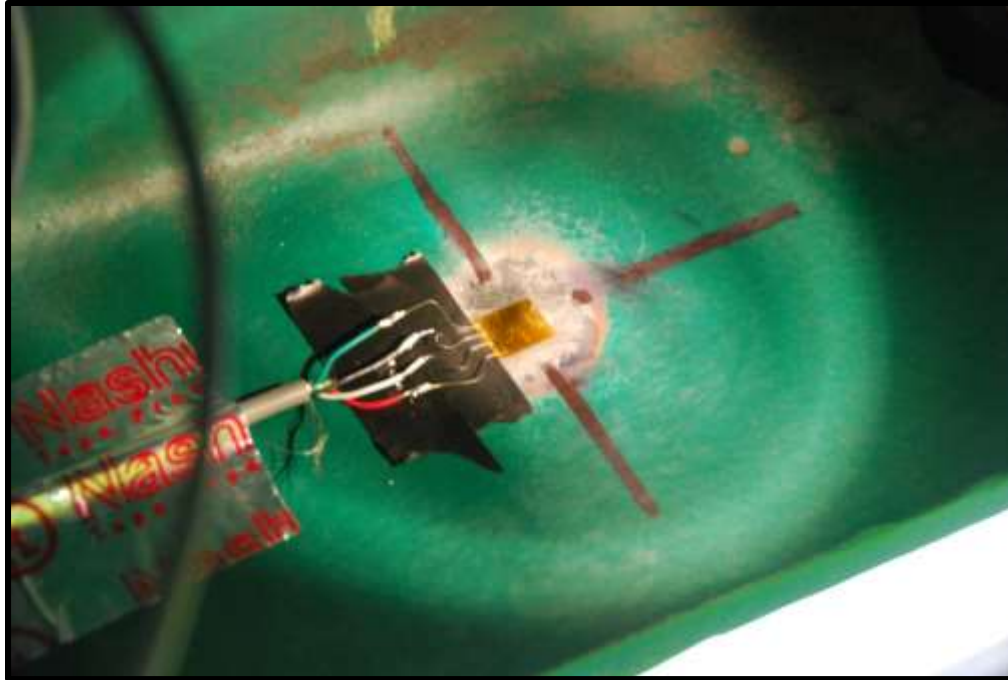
Photograph of Full Bridge Strain Gauge Installed on the Bottom Flange of Beam D, North Face
